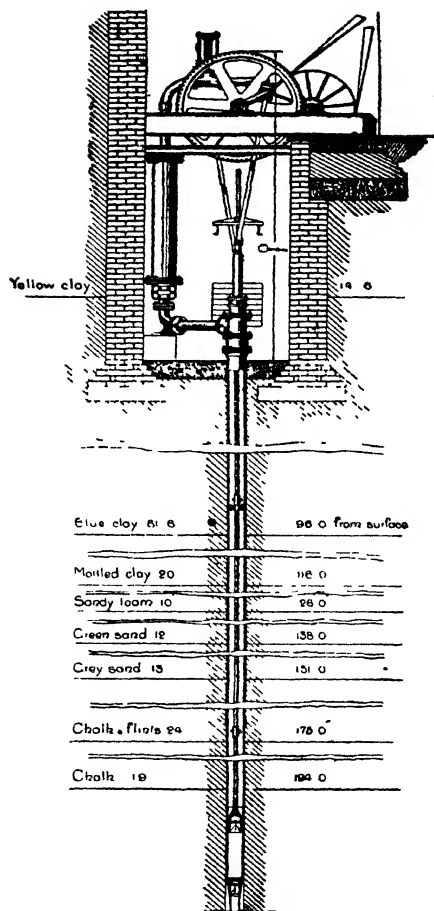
IMPROVED DEEP-WELL PUMP FIXED IN BORE-HOLE.
